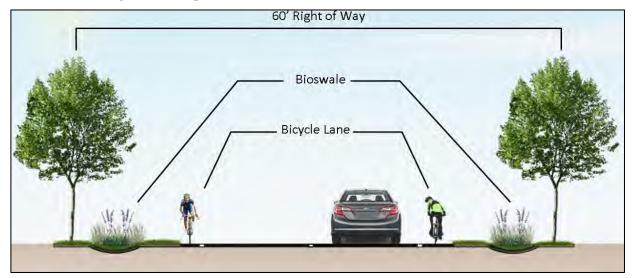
Proposed Interior Subdivision Road Cross Section
